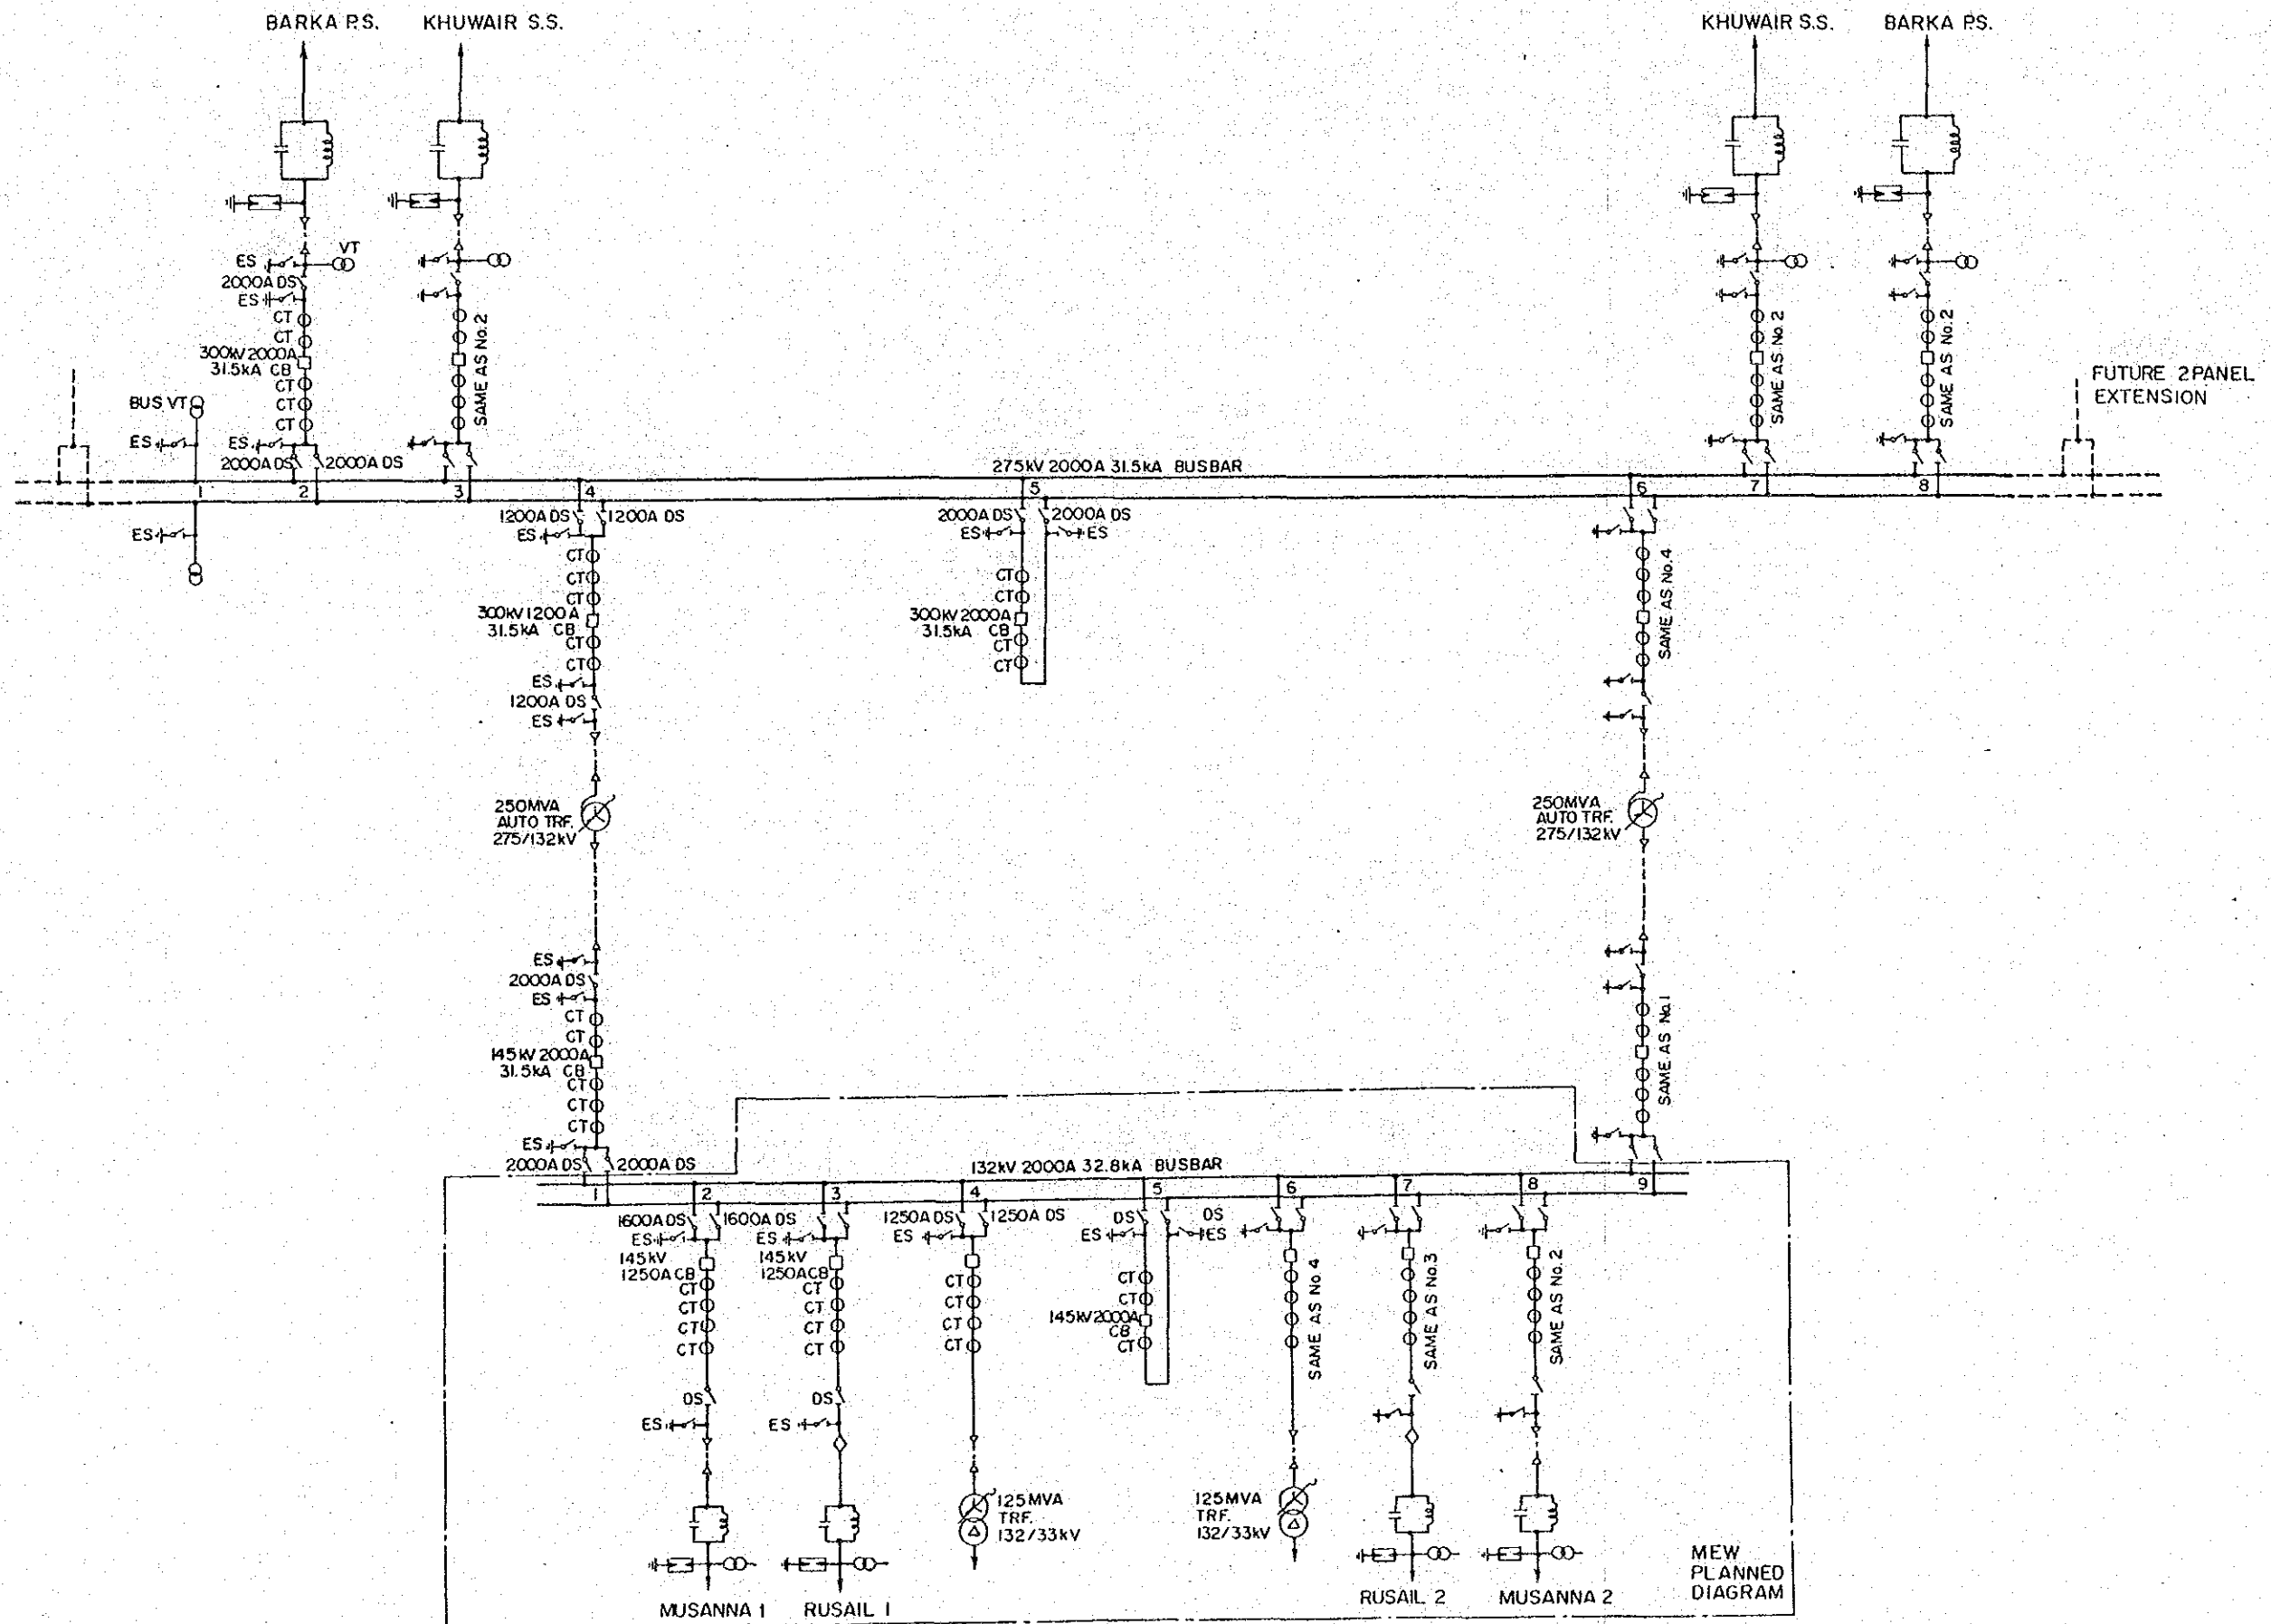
·8(1) KHUWAIR SUBSTATION SINGLE LINE DIAGRAM
